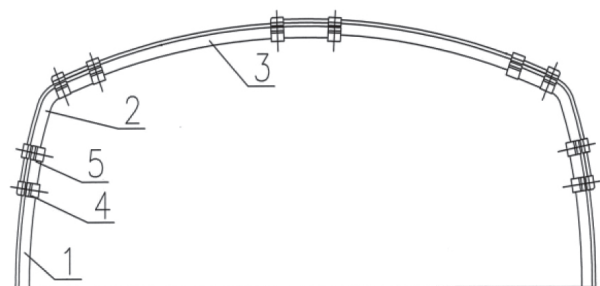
Six-element ŁPrP frame: 1 – side section I, 2 – side section II, 3 – top section, 4, 5 – shackles
